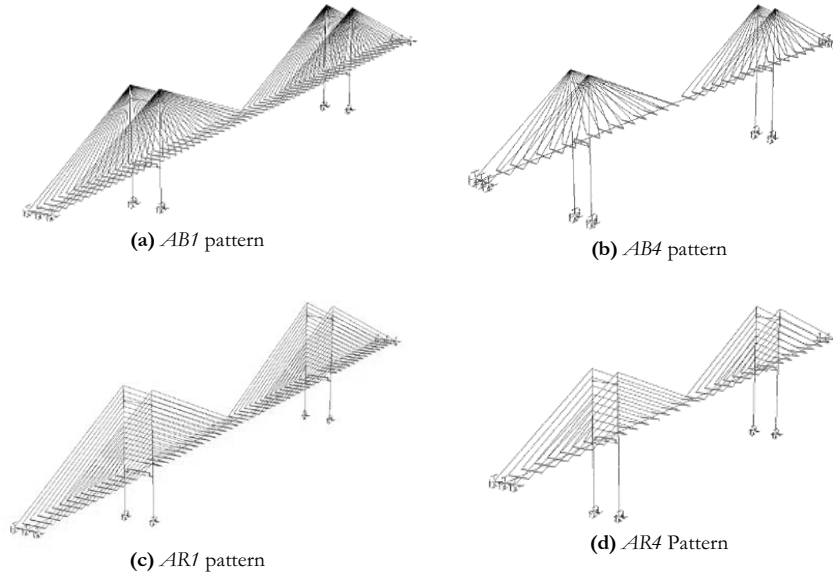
Complete 3-D Finite Element Models of Some Bridges
